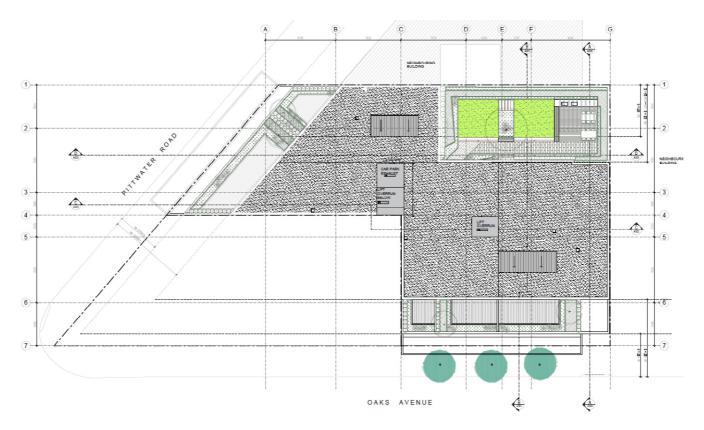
Site plan of development approved pursuant to DA2017/1063.
